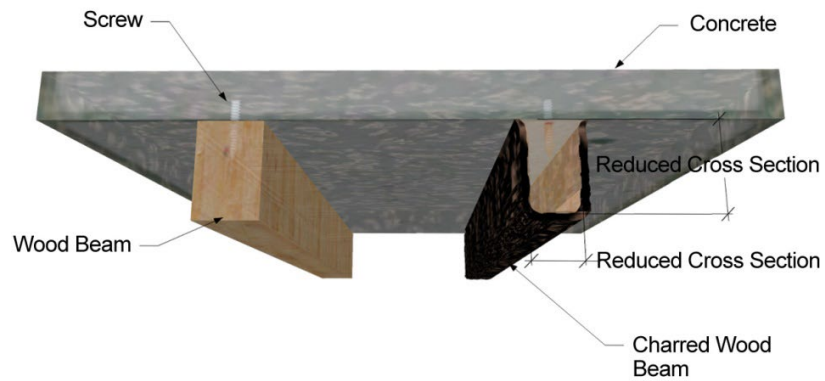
Reduced cross-section of a timber–concrete composite structure.
